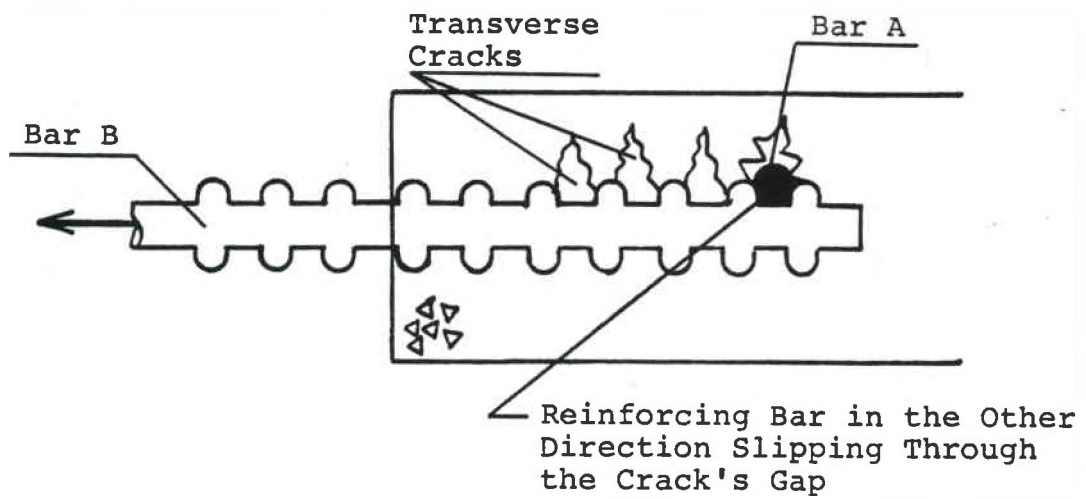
Formed Cracks Reducing the Reinforcing Capacity in Two-Way Slab. (Side View)
